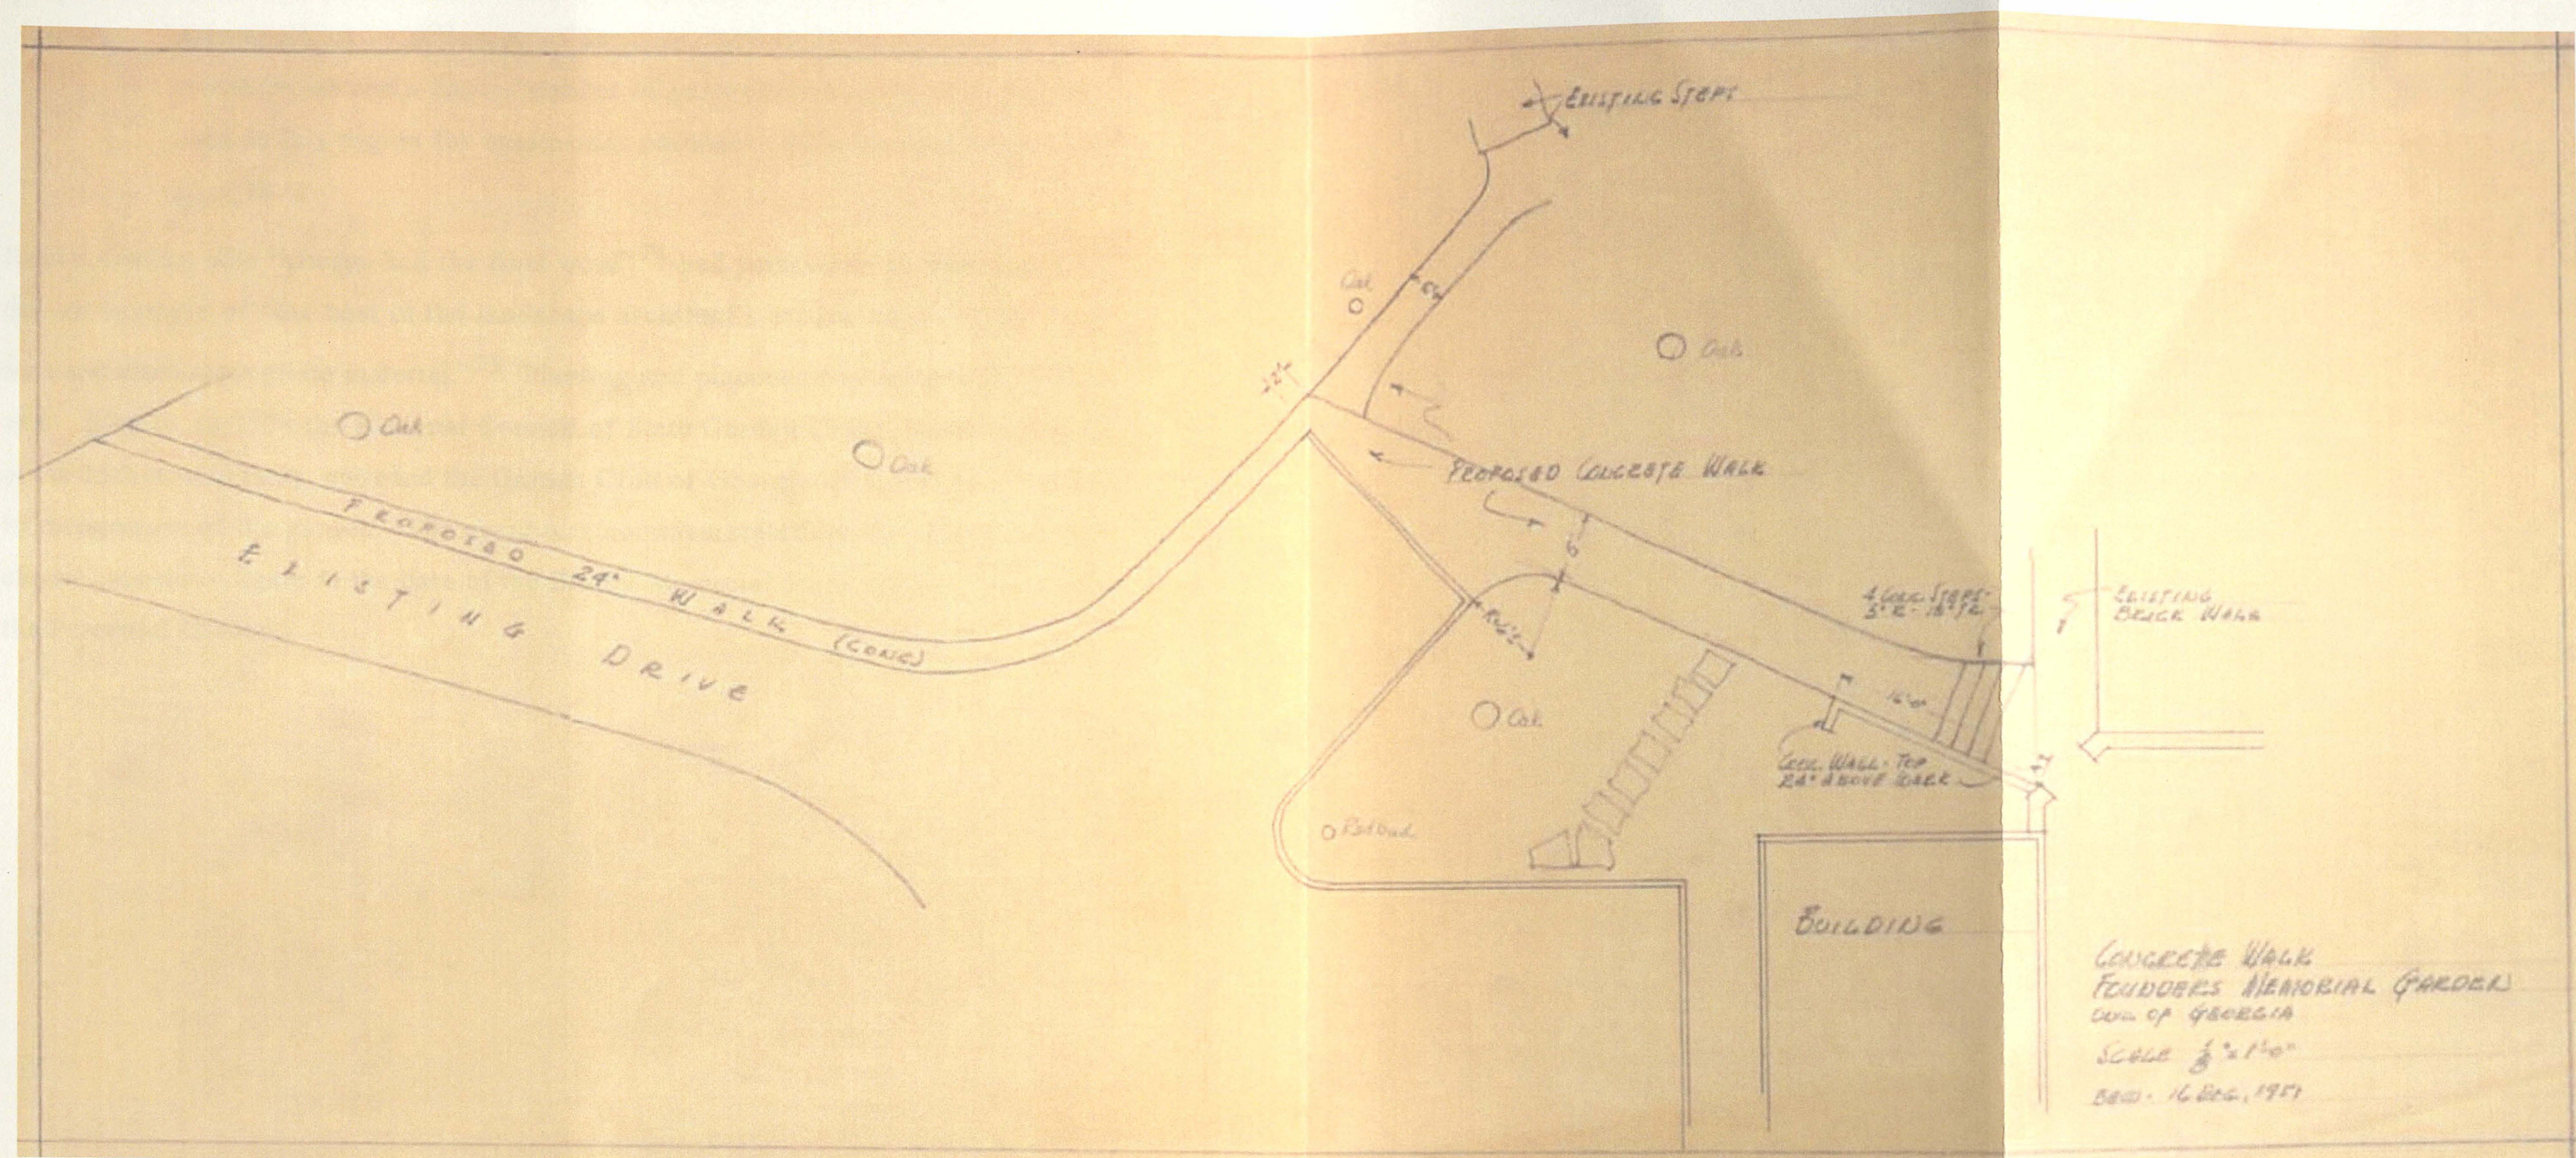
Plan for Parking Lot connector walks. Brooks Wiggington 1951.
